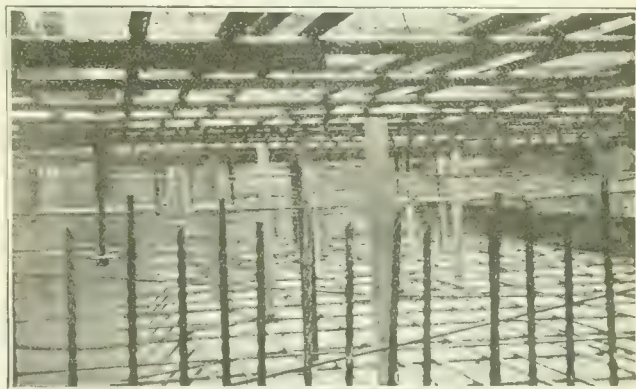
REINFORCING OF MAT UNDER TURBINE ROOM
